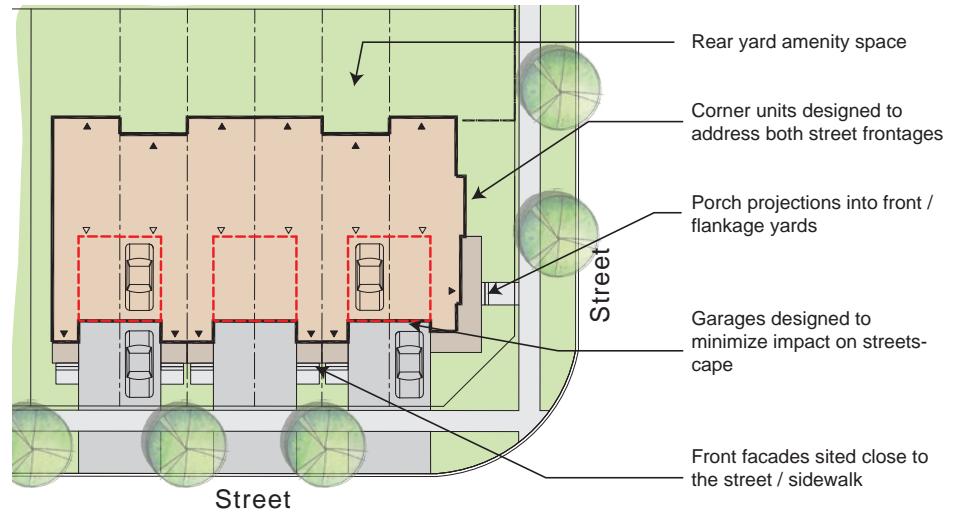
Conceptual plan layout for on-street townhouses
